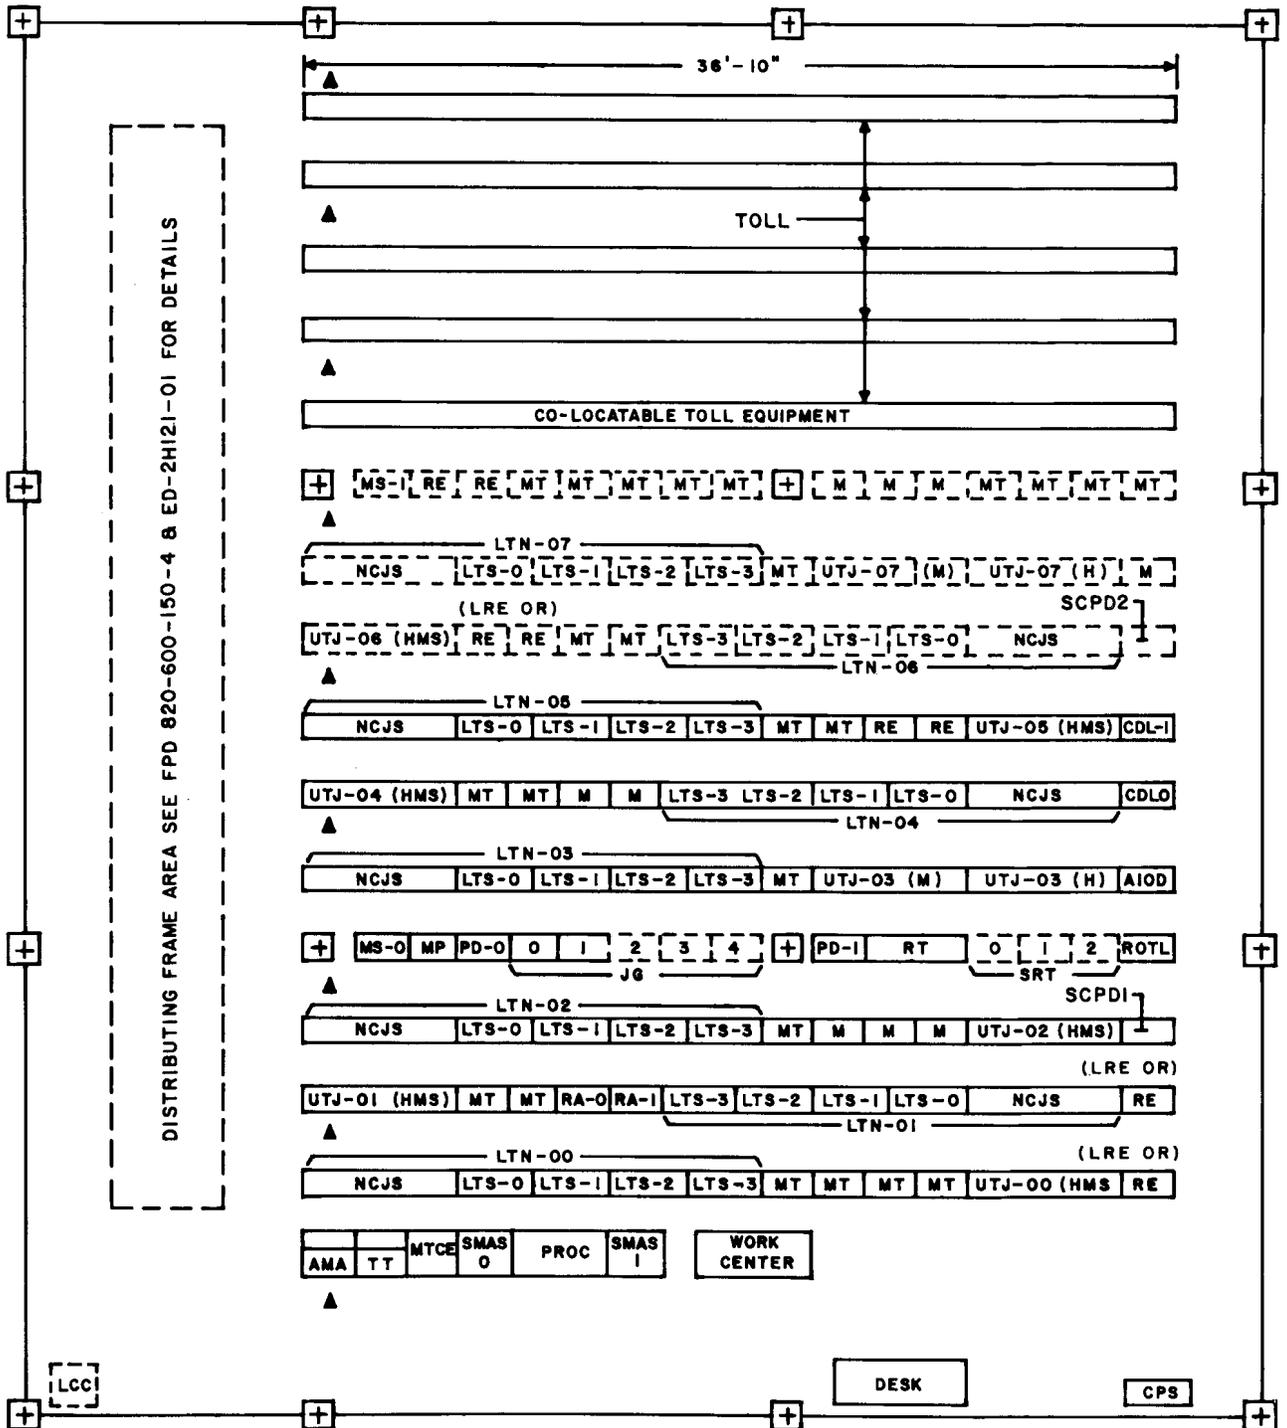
Typical No. 2B ESS Office Floor Plan With a Ferreed Network
